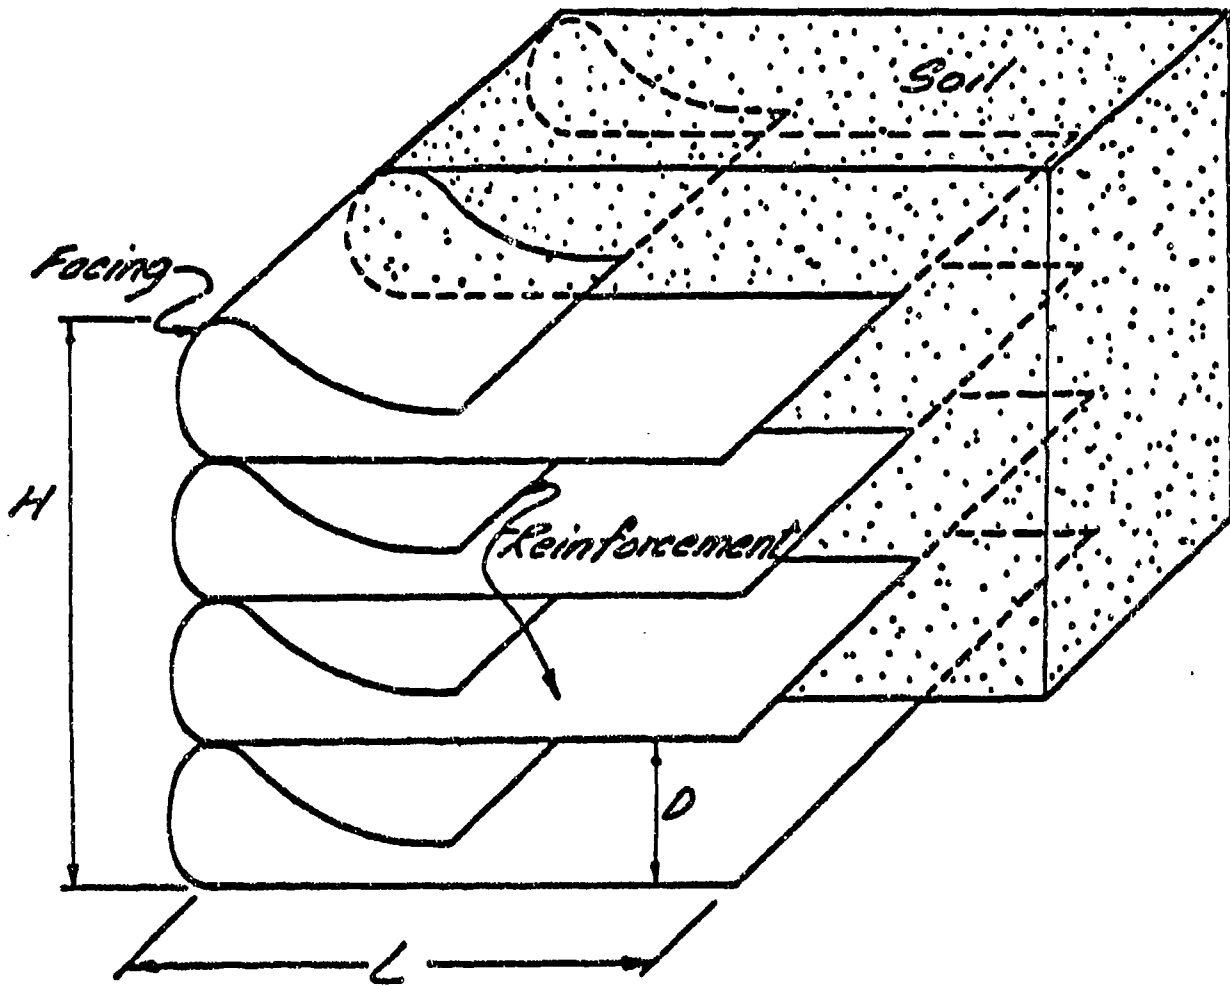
Schematic Diagram of a Reinforced Soil Wall Using Geotextile Shear Reinforcements (Reference 25).
